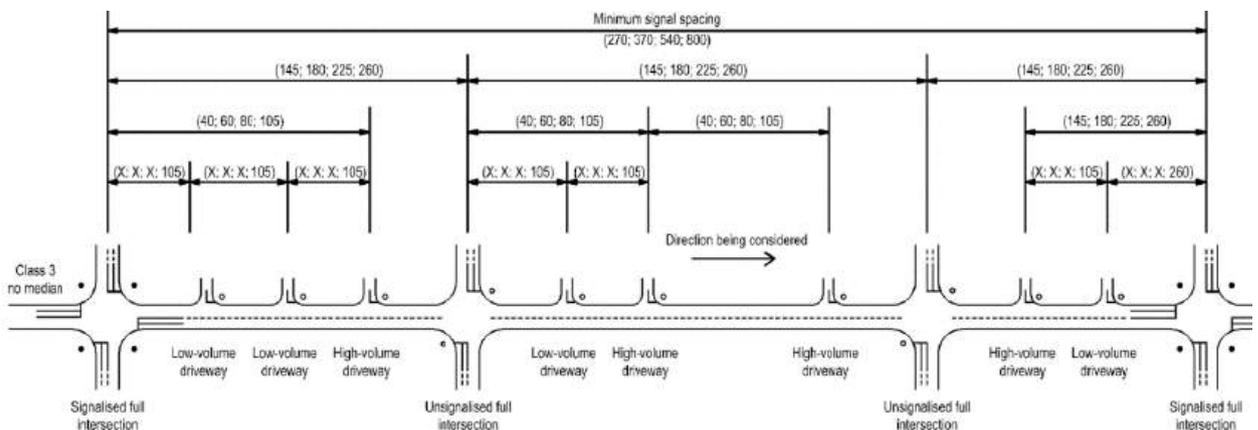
AMG Intersection Spacing for Class 3 Roads
